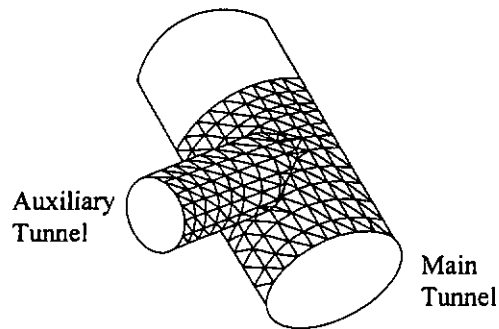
Designed surface joint of a tunnel intersection formed by TIN.
